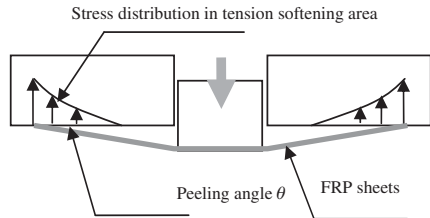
Force equilibrium between the spalling force and tensile stresses in concrete.
